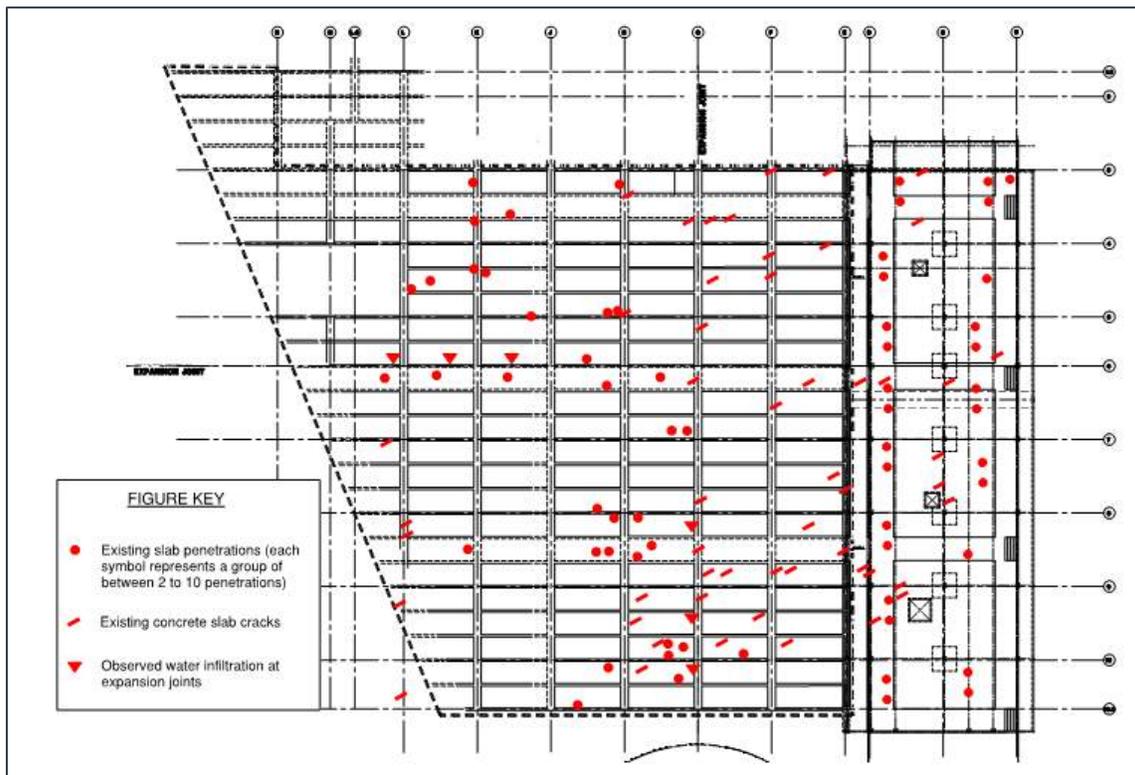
Observations of water infiltration at slab underside from parking garage Level B1
